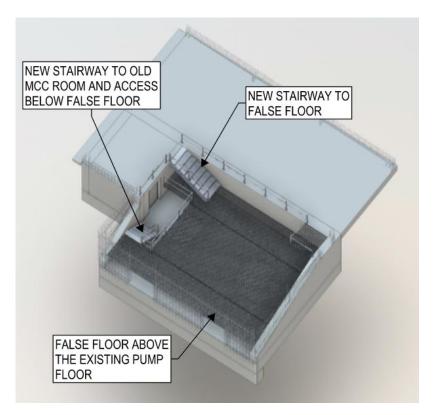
Proposed false floor for electrical equipment – isometric view
